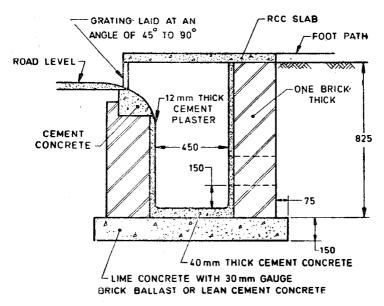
DETAILS OF CURB INLET TYPE ROAD GULLY
